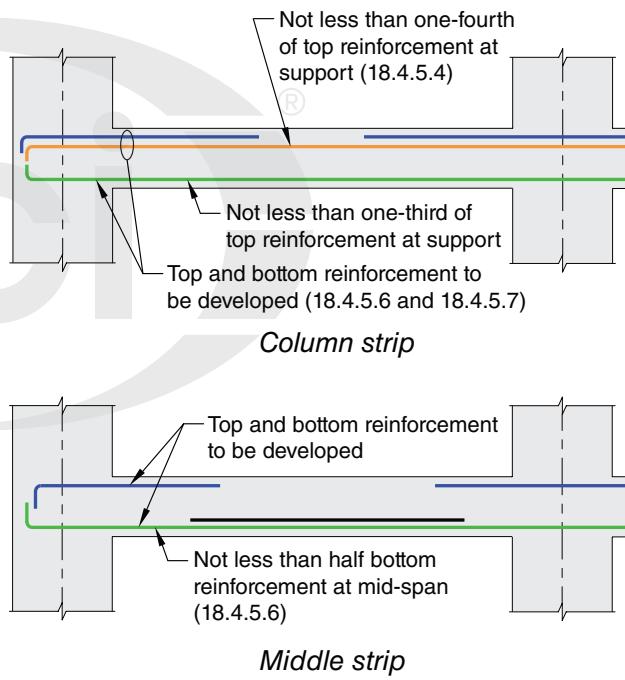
Arrangement of reinforcement in slabs.
